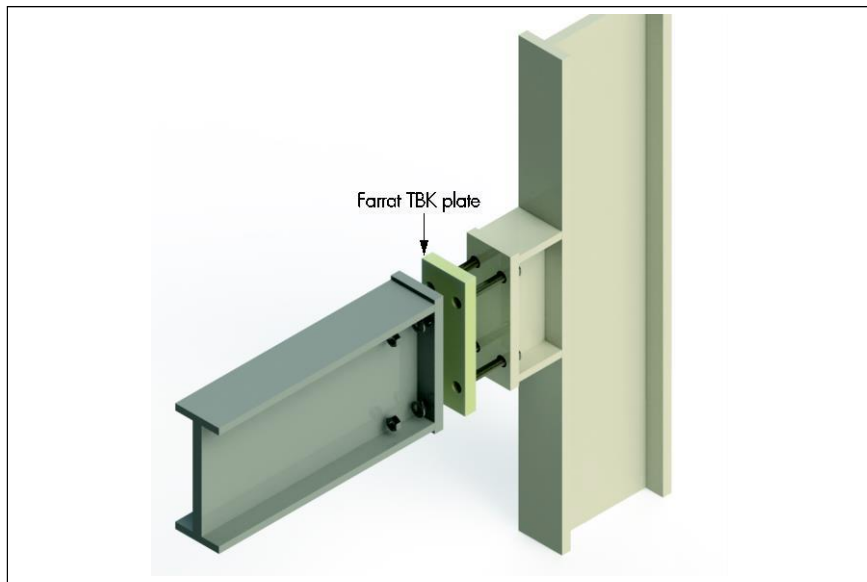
Typical example applications of STRUKTRA TBF, TBK and TBL Structural Thermal Breaks
